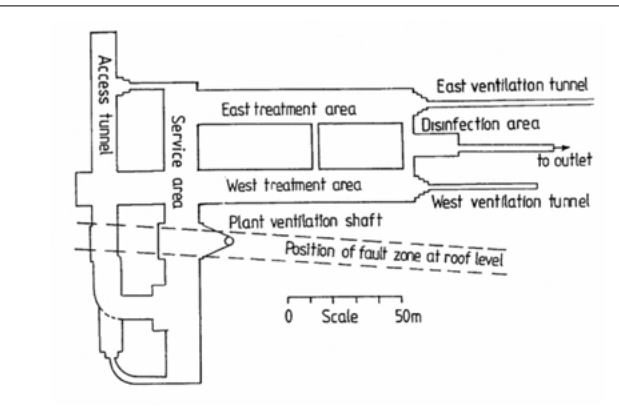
Layout Plan of the Stanley Underground Sewage Water Treatment Works
